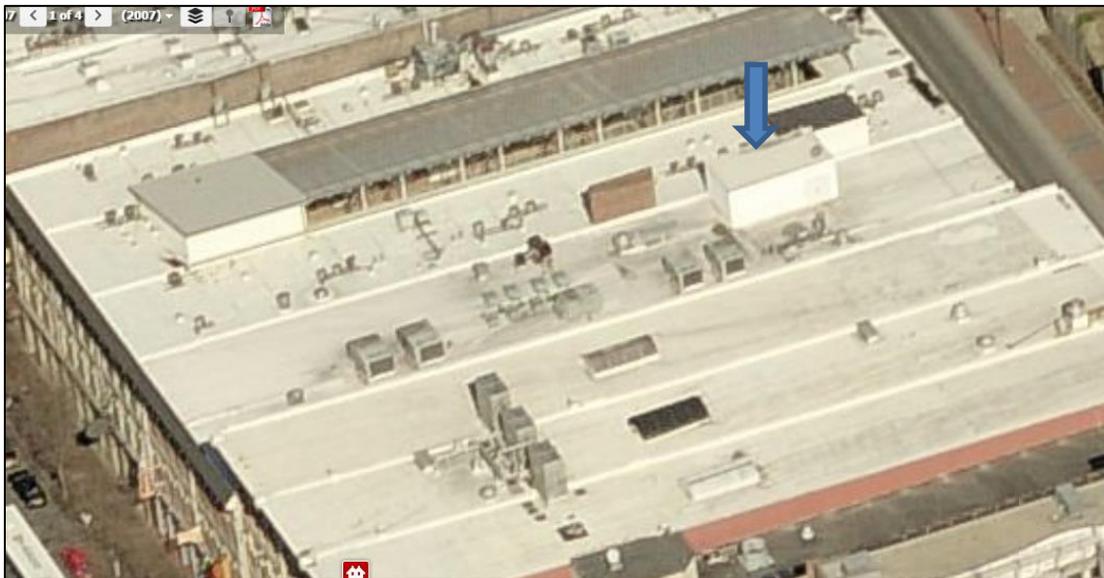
The rooftop stairwell addition nearest to First Avenue has been in place since at least 2007.
